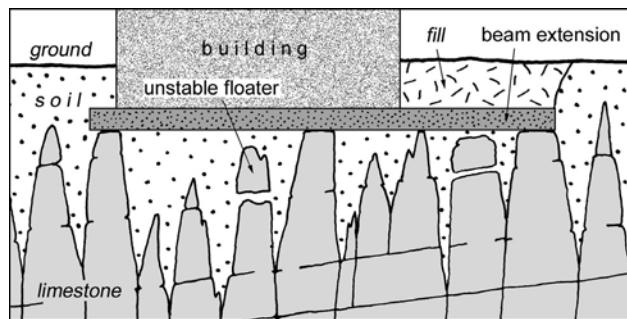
Foundation raft or ground beams with extensions to reach stable rock pinnacles in a deeply fissured limestone rockhead.
